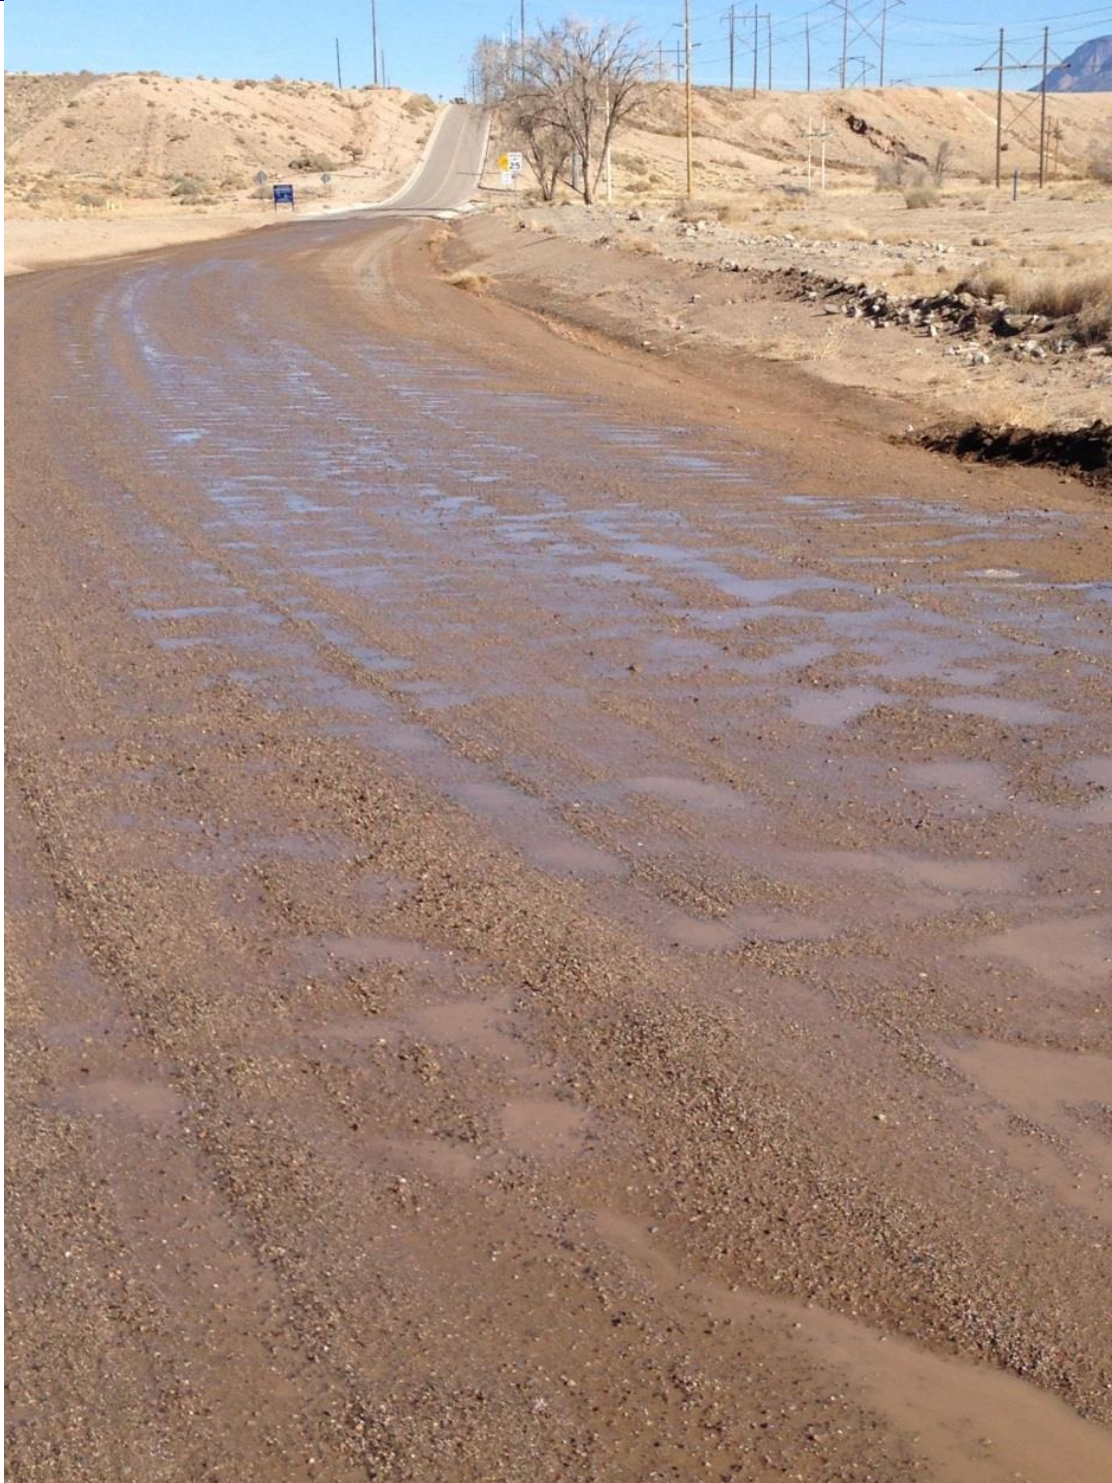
Poleline Road looking north, Segment 1. The paved surface near top is a brief section of this dirt road. The highest strains measured on the instrumented rod were on the dirt section just north of the paved section (Figure 4.8).
